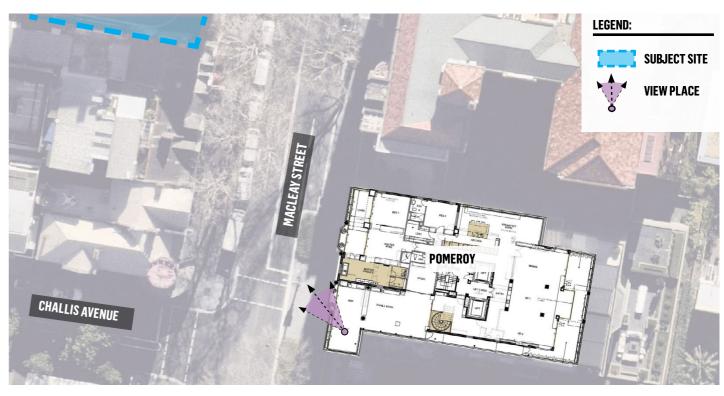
The Pomeroy floor plan, Unit 801, viewpoint indicated in purple (approximate).
